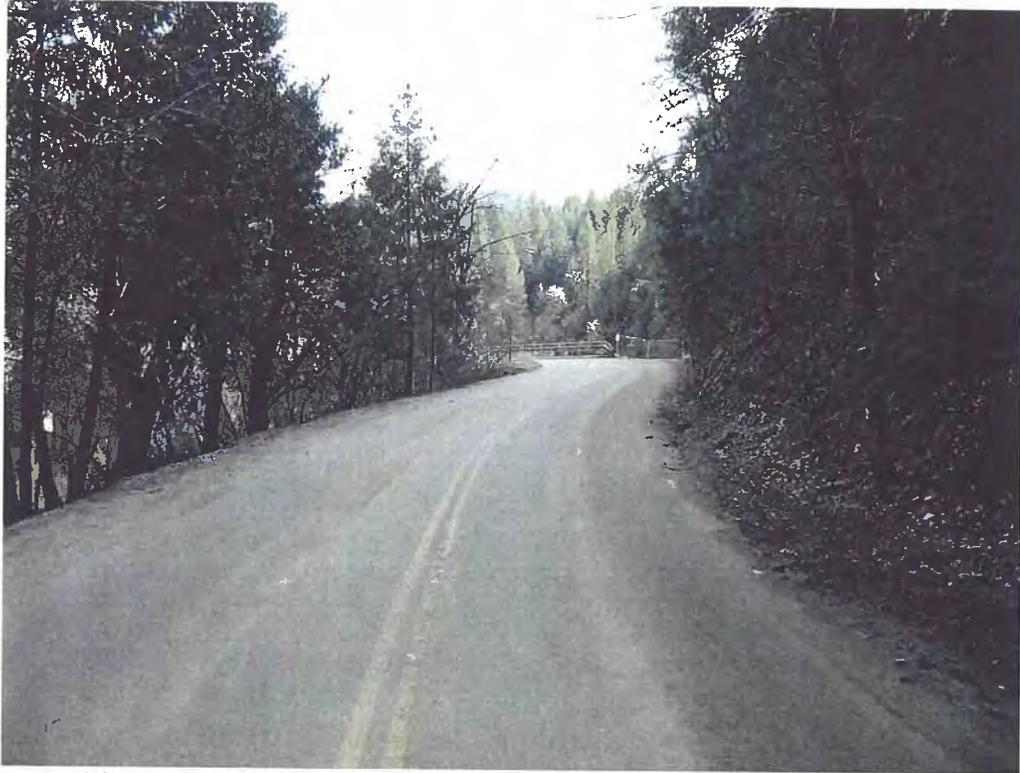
MP 5.38 – The town of Washington, California, looking northeast.
